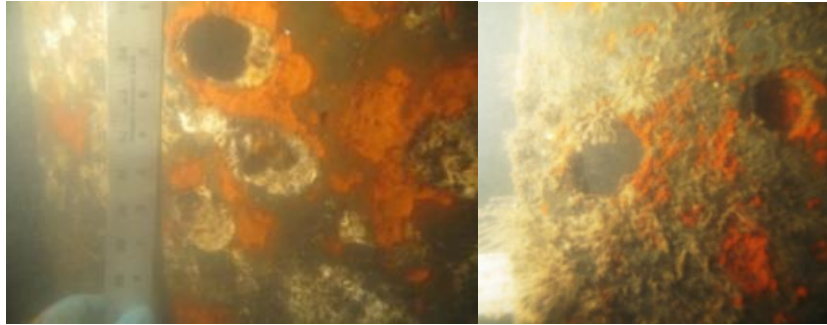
Picture of Corrosion Pits on Submerged Steel Piles.
